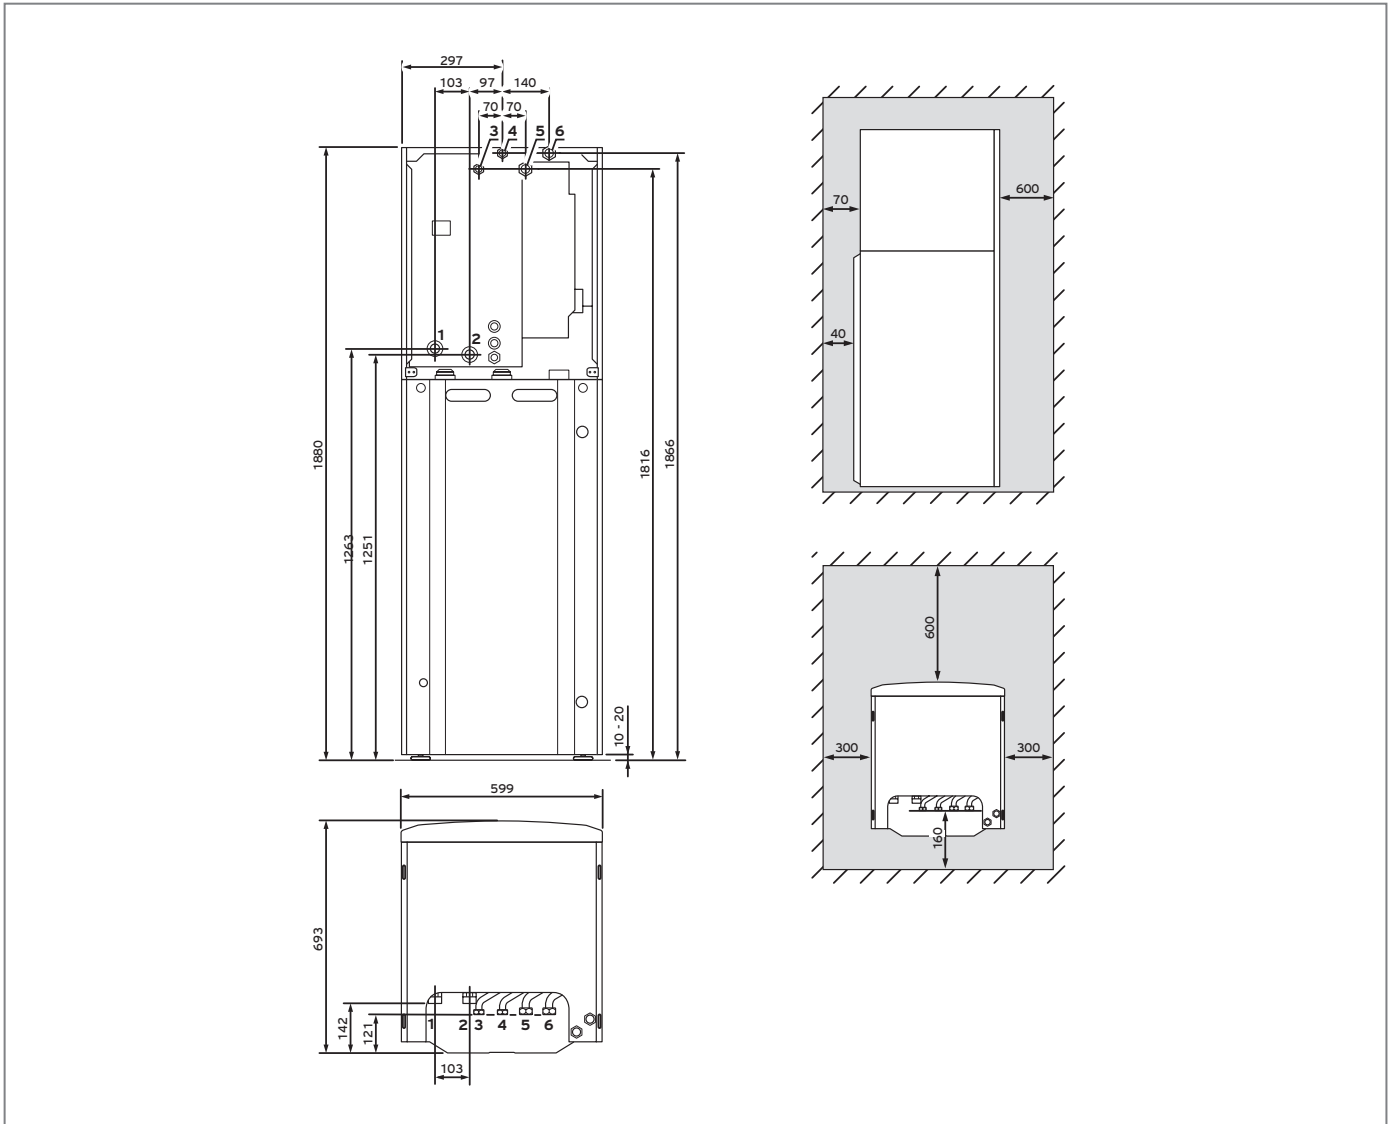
uniTOWER VIH QW 190/1 E dimension drawing and connection dimensions
